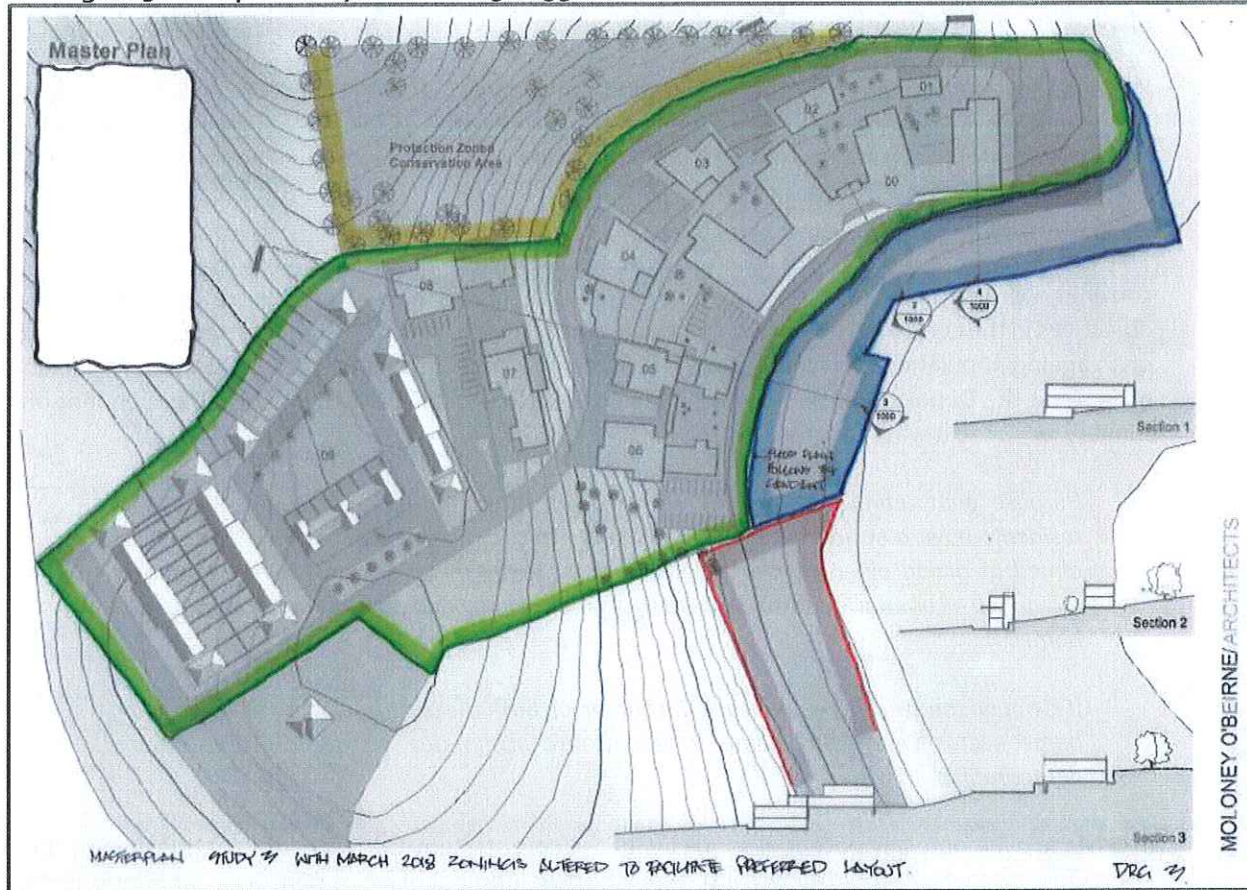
Proposed Layout showing existing Proposed Zoning Boundaries
